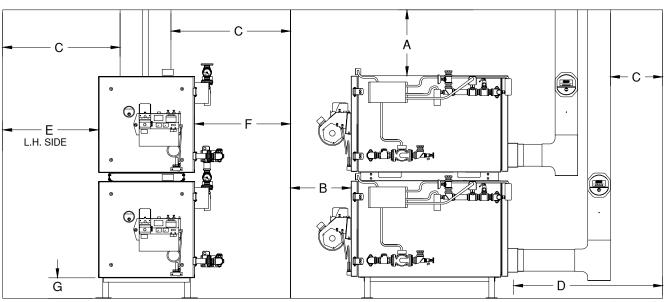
B - Dual-Stacked Boilers Minimum Installation Clearances
